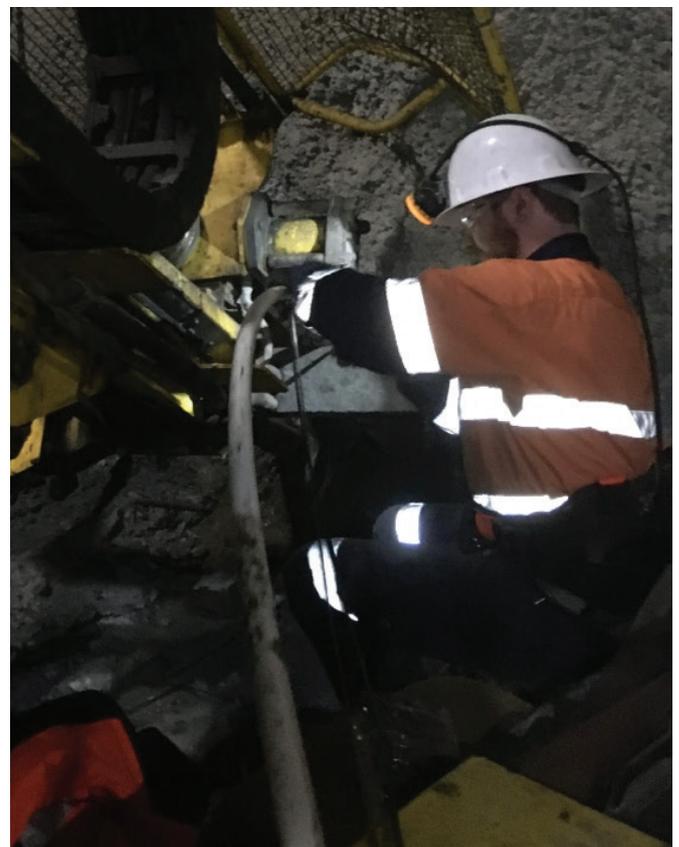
HMA technician Installing 400m string of vibrating wire Piezometers underground.
